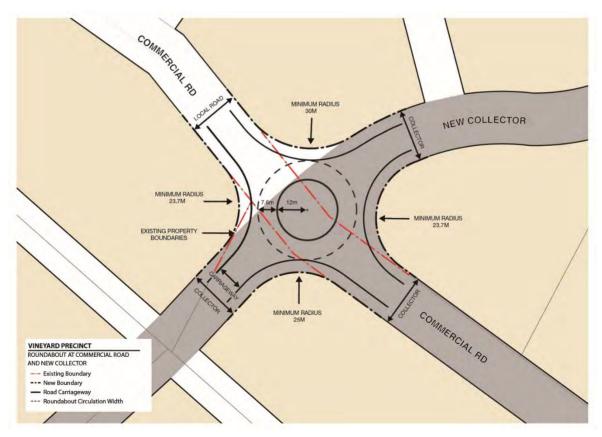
Indicative location and design of roundabout at Commercial Road and new collector road
